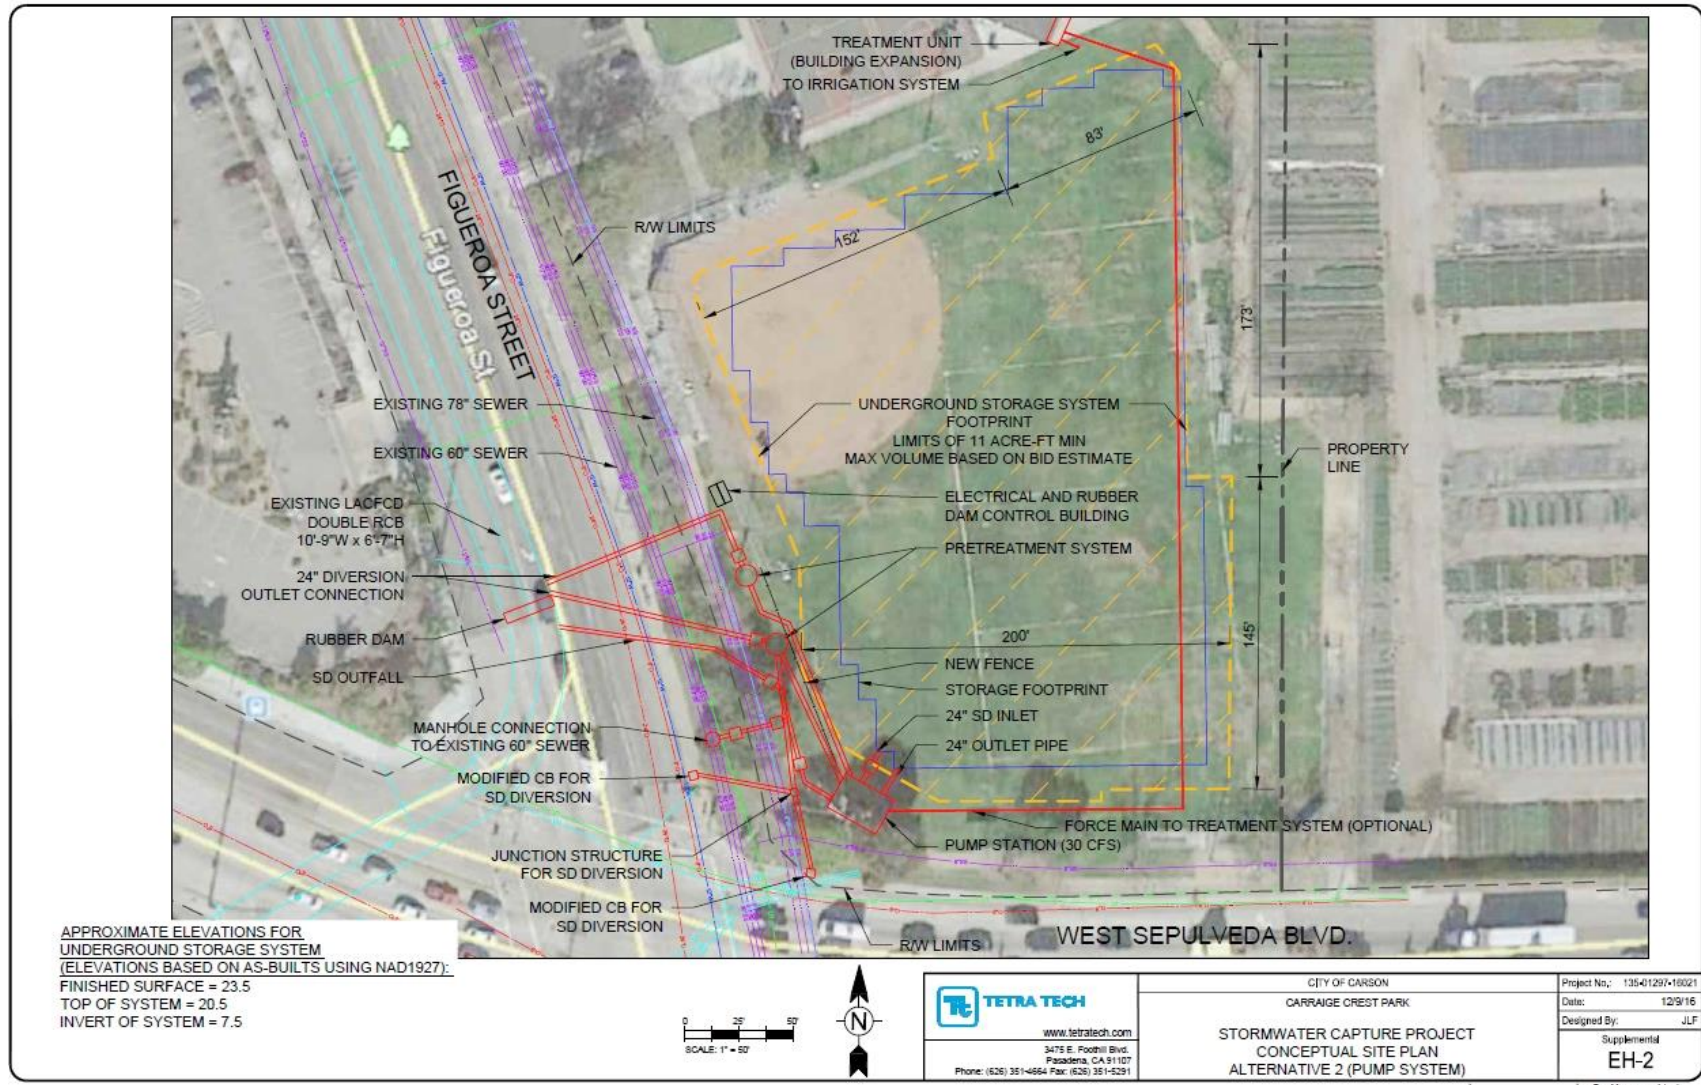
Carriage Crest Park Alternative 2 BMP Layout
